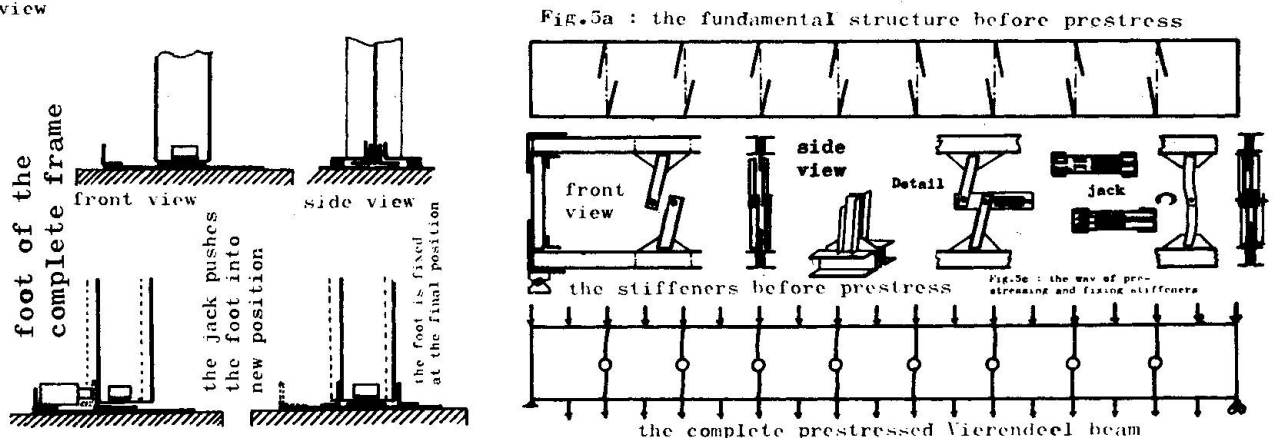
THE VIERENDEEL BEAM PRESTRESSED BY TRANSVERSE STIFFENERS
